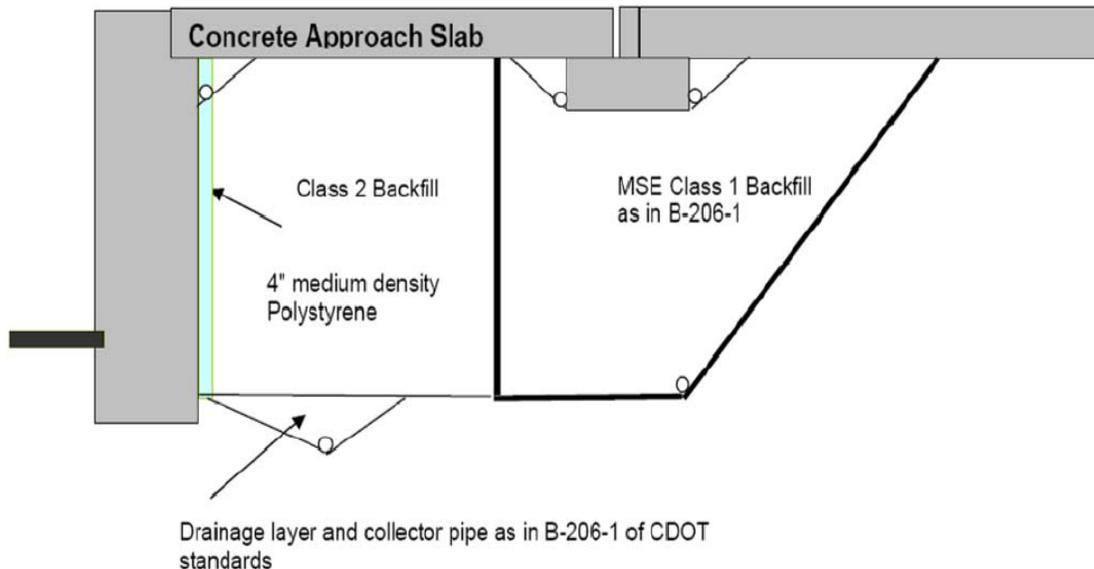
Mechanically stabilized earth (MSE) walls system under sleeper slab (Abu-Hejleh et al., 2006)
